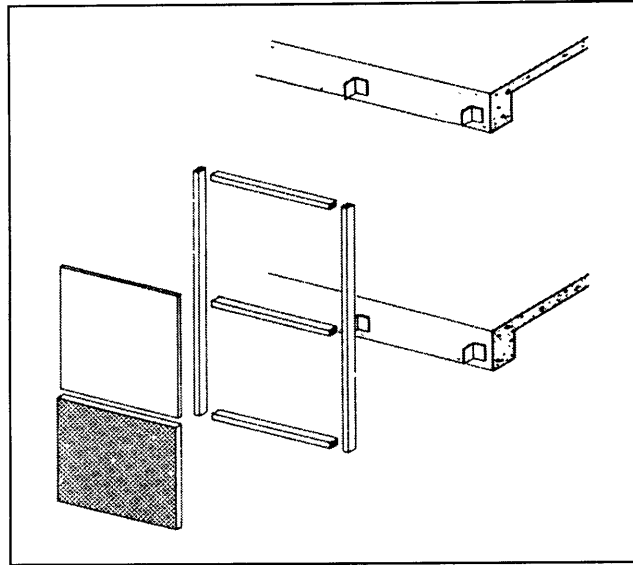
Illustration of building envelope frame components which are anchored to spandrel beams in the main structural frame of a building .
